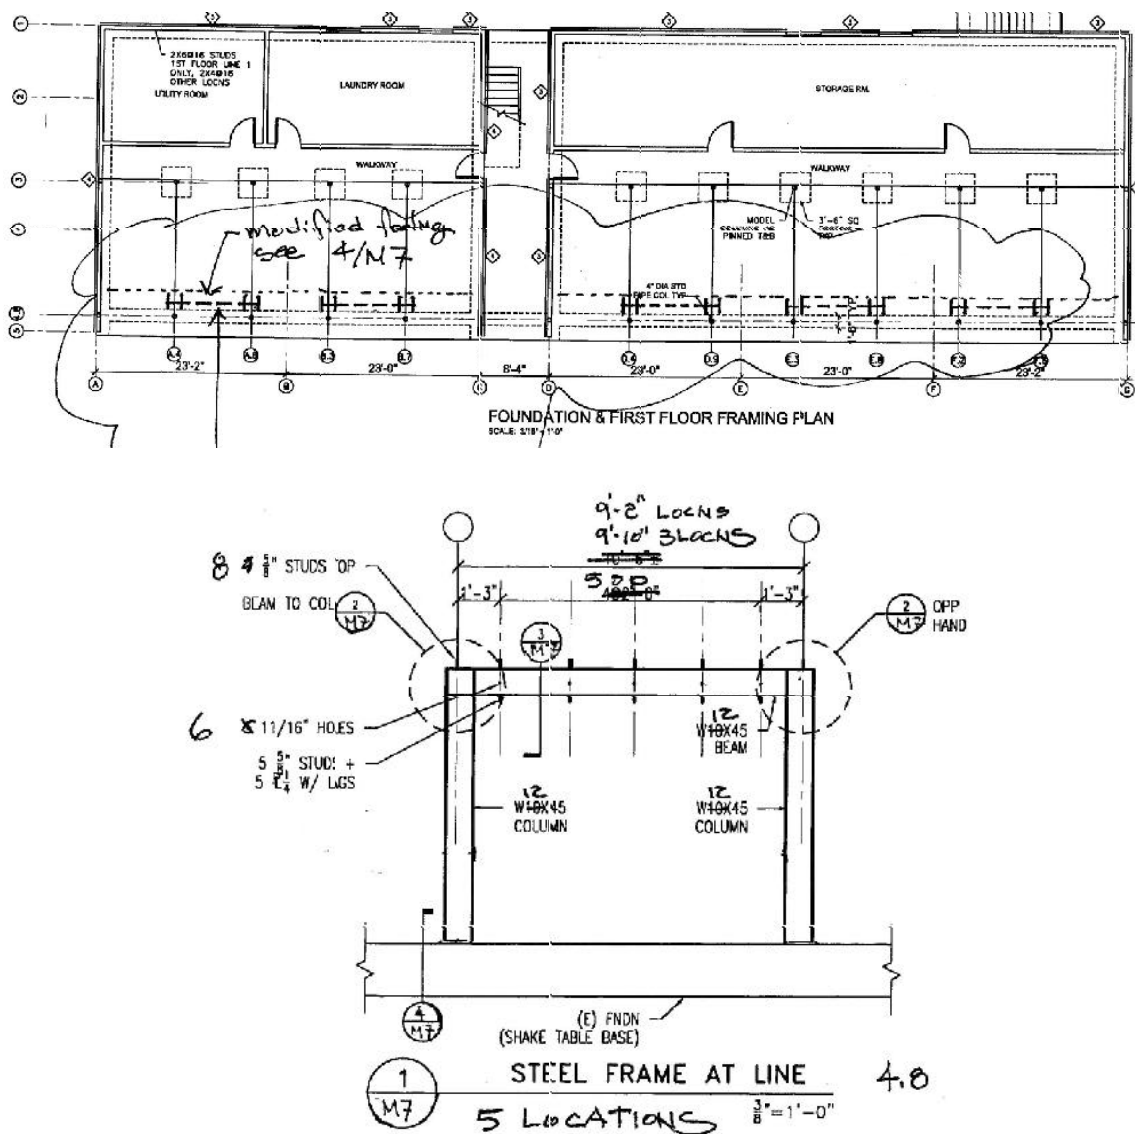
Locations and Details of Moment-Resisting Steel Frames Used in the Retrofit of Measure No. 7 of the Apartment Index Building (Cobeen 2001).
